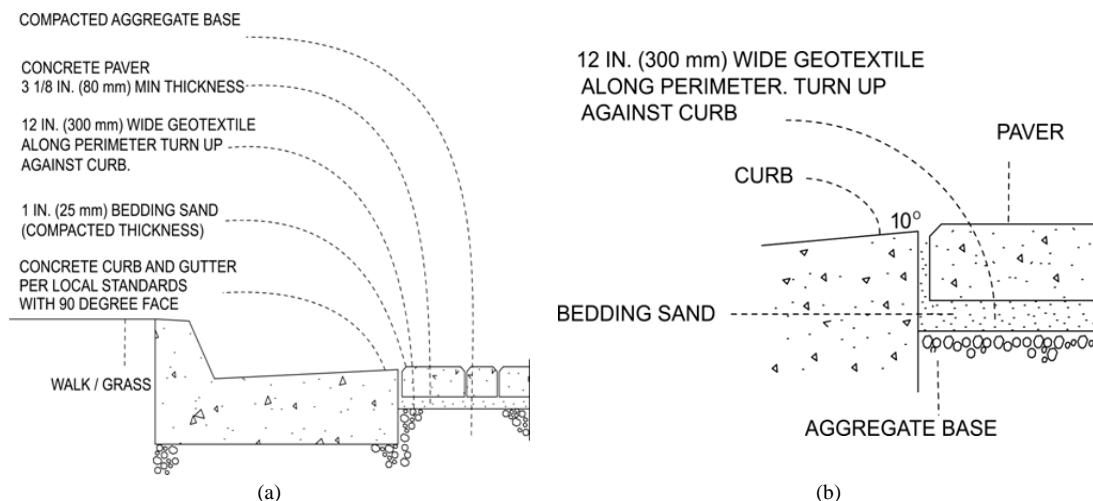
(a) Retrofit for Gully Floor, (b) Retrofit for Gully Floor 2
